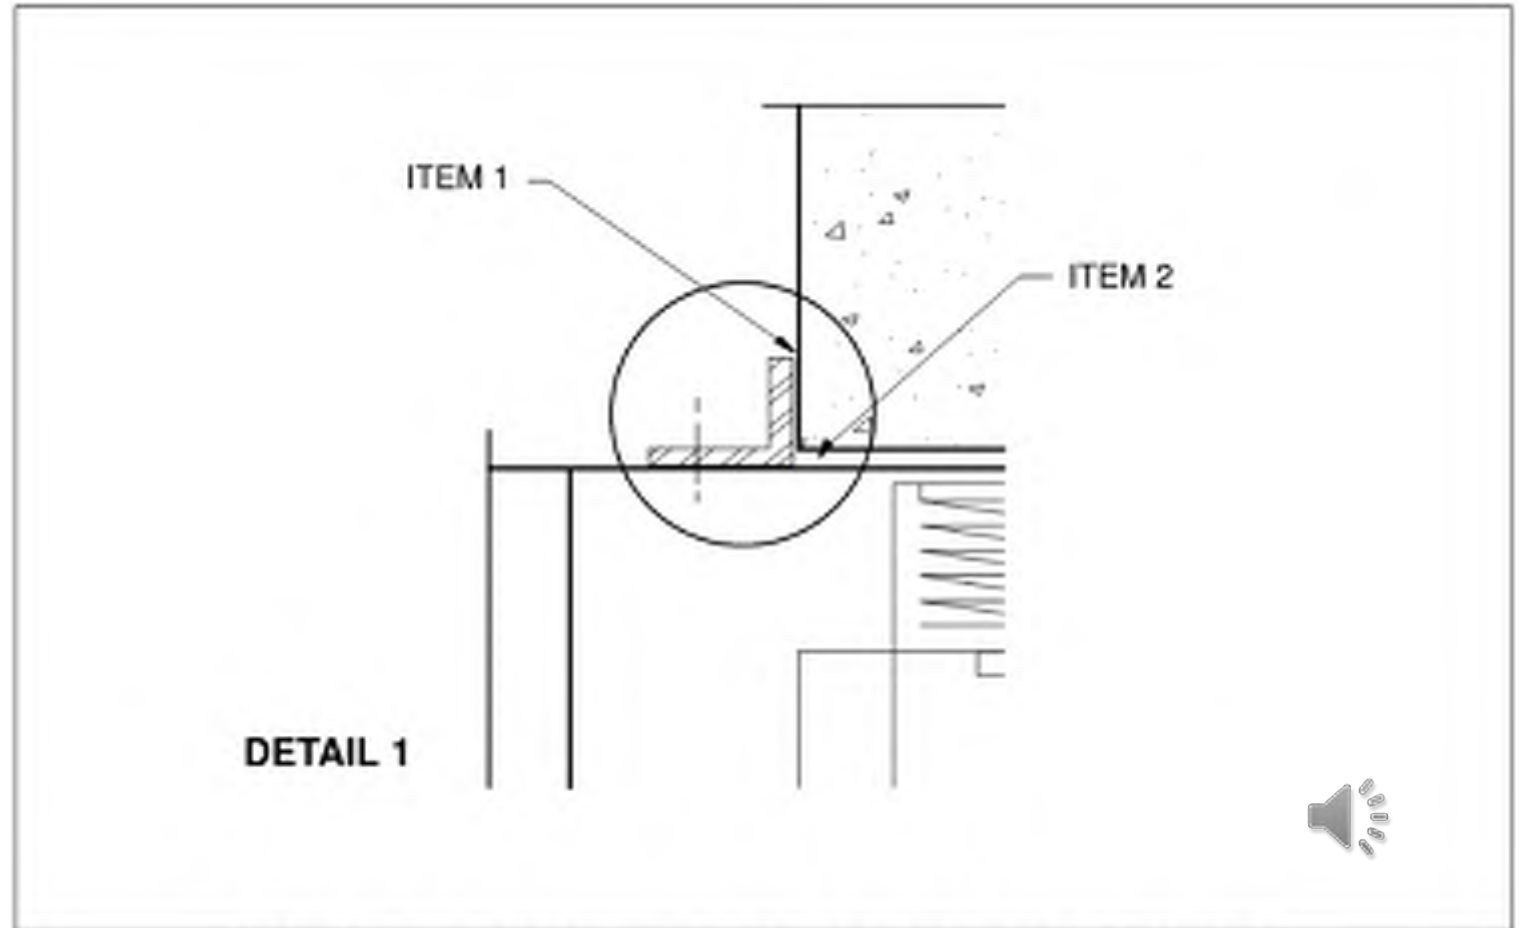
IMPROPER FIRE DAMPER INSTALLATIONS
